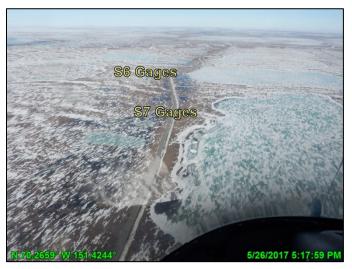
Local melt accumulating along GMT1 access road, looking east; May 26, 2017
